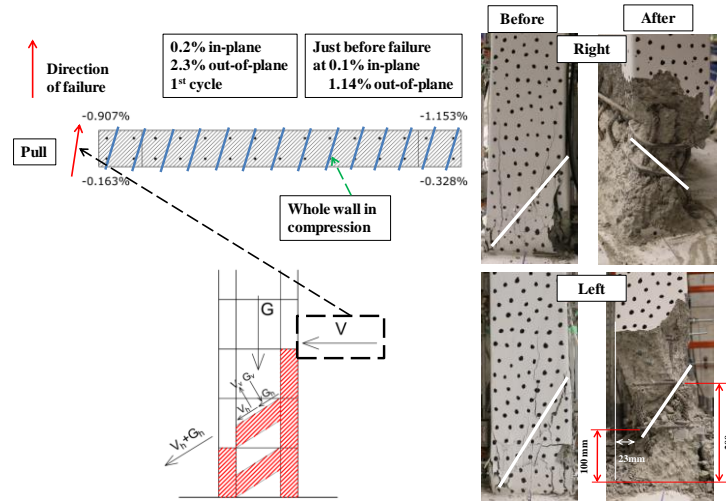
Strut and tie model of specimen SP2-ND just before failure
